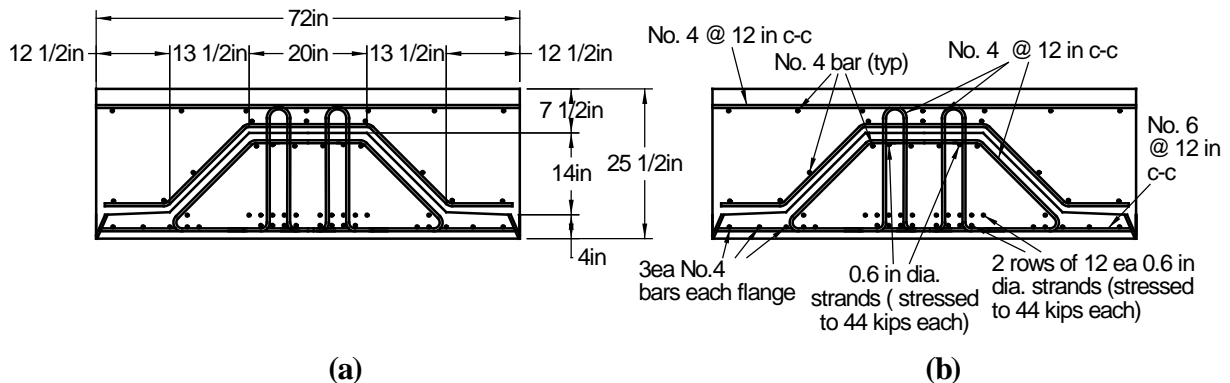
(a) Typical Composite Cross-Section, (b) Typical Reinforcing Details. Note: c-c = center-to-center, typ = typical, ea = each.
